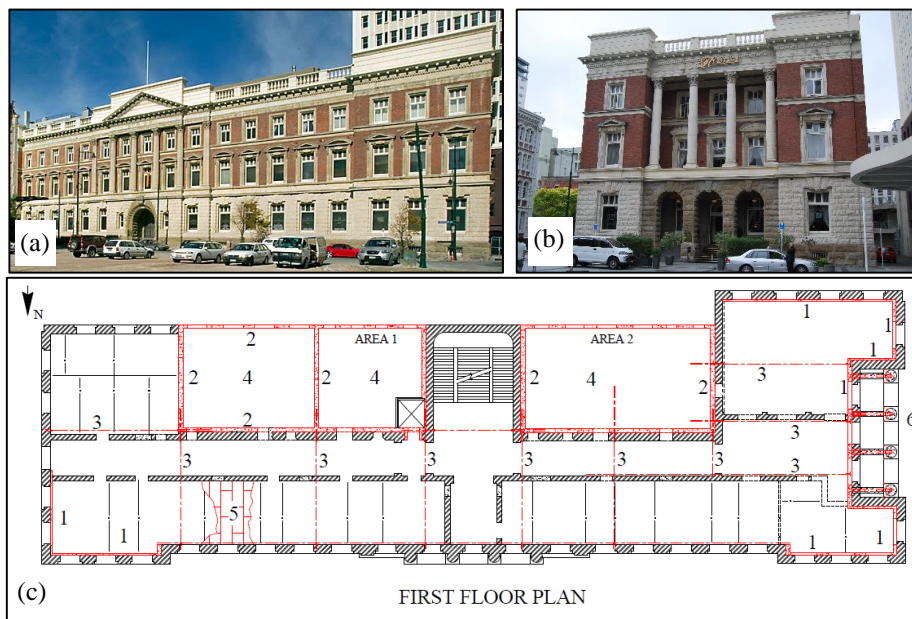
Retrofit of the Heritage Hotel, 30 Cathedral Square: (a) Exterior view of north elevation; (b) Exterior view of west elevation; (c) First floor plan. 1. New concrete skin walls; 2. New concrete shear walls; 3. New steel floor ties; 4. New hollow core concrete flooring; 5. New plywood overlay to existing flooring (typical); 6. Prestressing cables at centres of existing masonry columns
